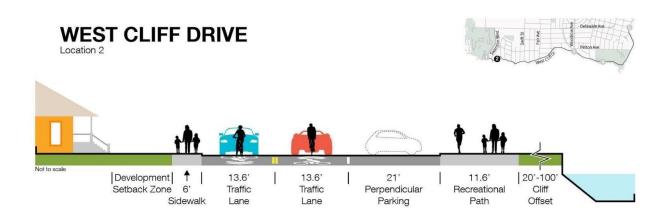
Cross Section of West Cliff Drive Alternative 1 Enhancements at Pyramid Beach parking lot
